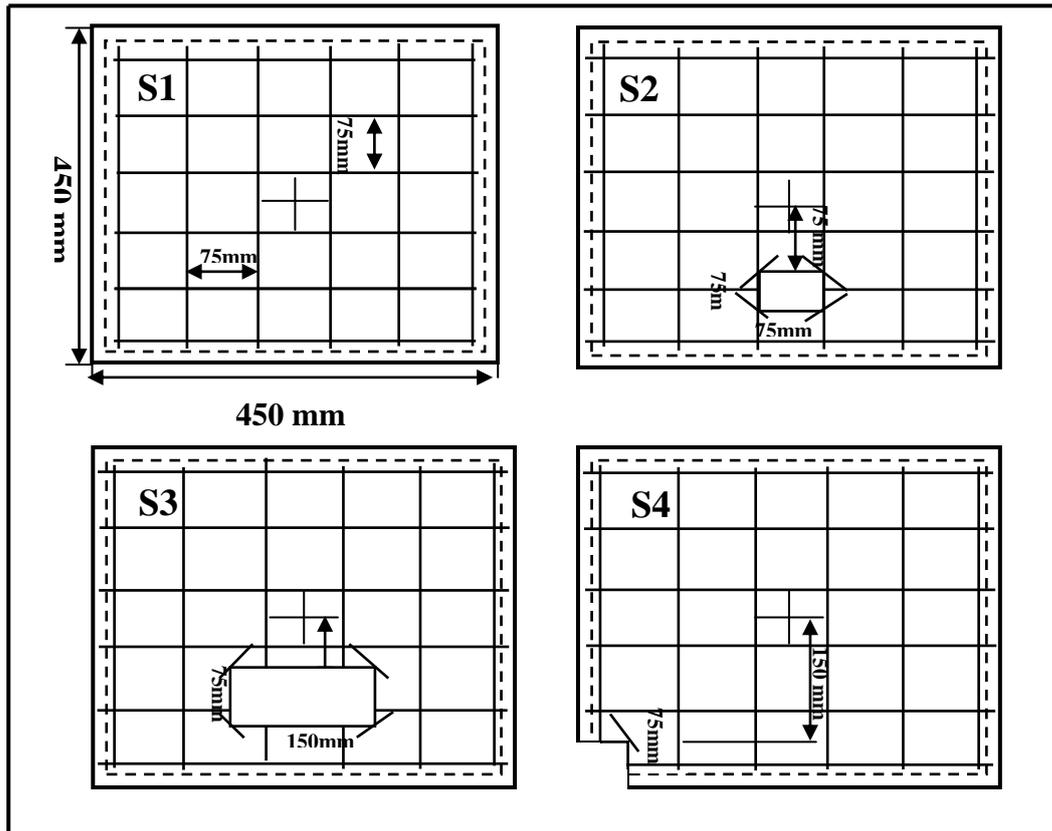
Dimensions and Reinforcement Details of Slabs in Group (A)
